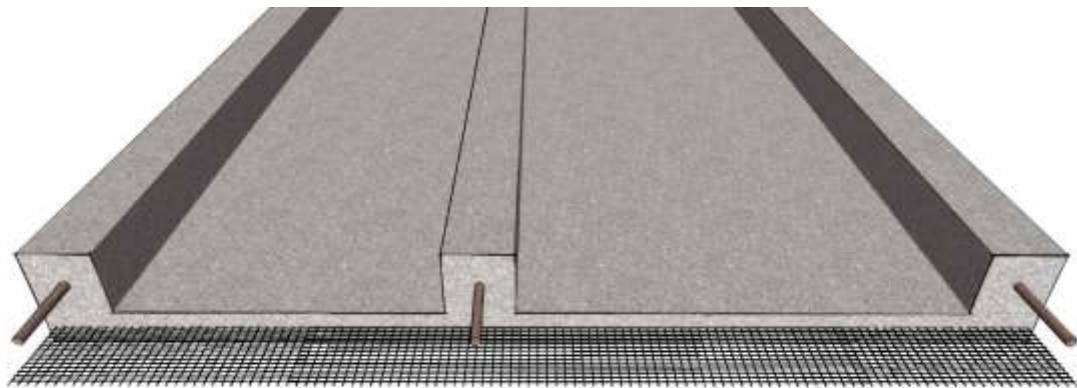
Cross-section of a ribbed concrete panel (Image source: Jensen 2016)
